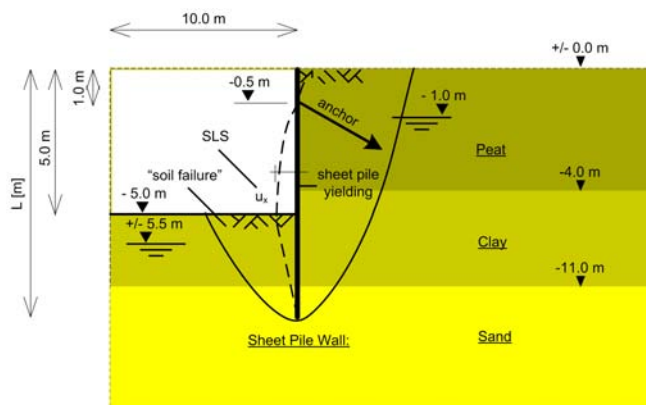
Example Properties - Anchored Retaining Wall In Layered Soil
